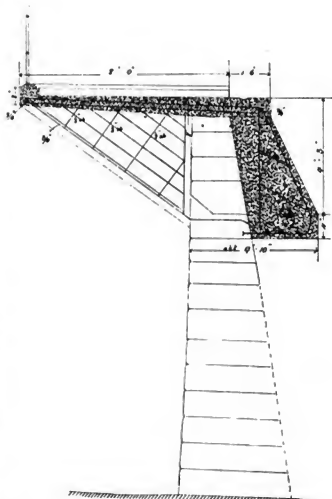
SECTION OF REINFORCED CONCRETE FISH STAND AT BRIDLINGTON.
